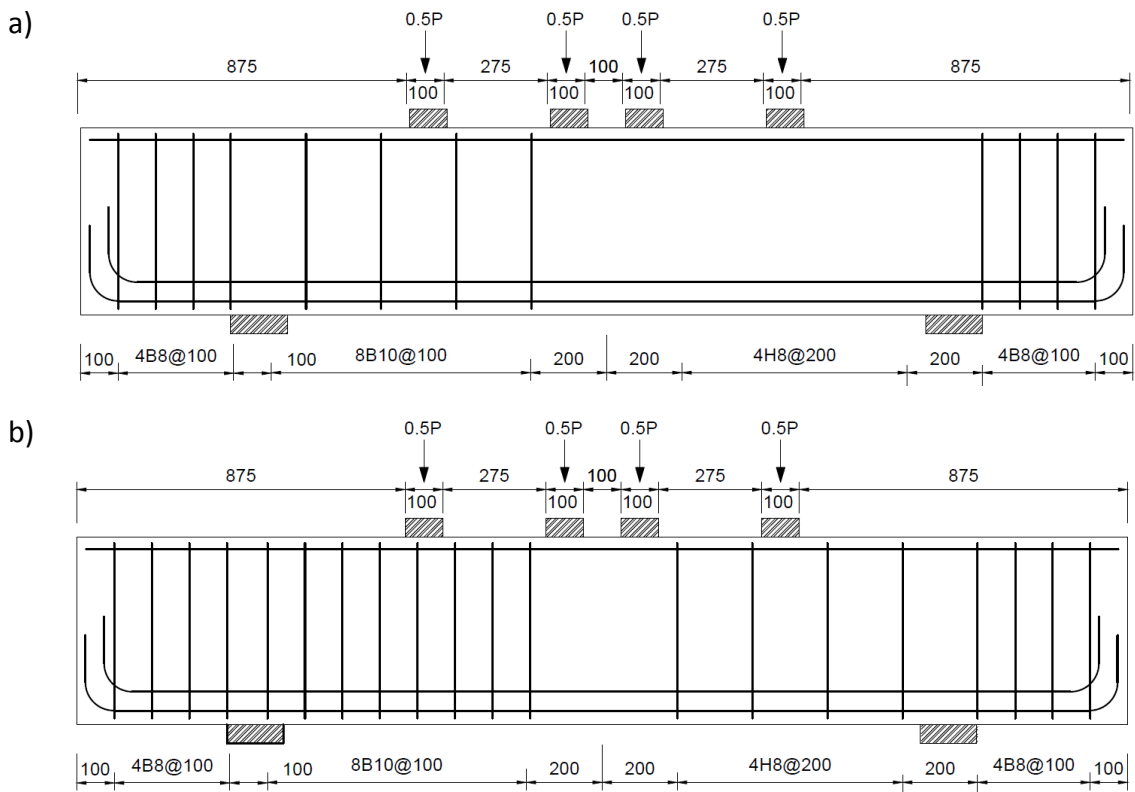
Cross section of the series A of test beams a) beams loaded in the compression face and b) beams loaded in the tension face.
